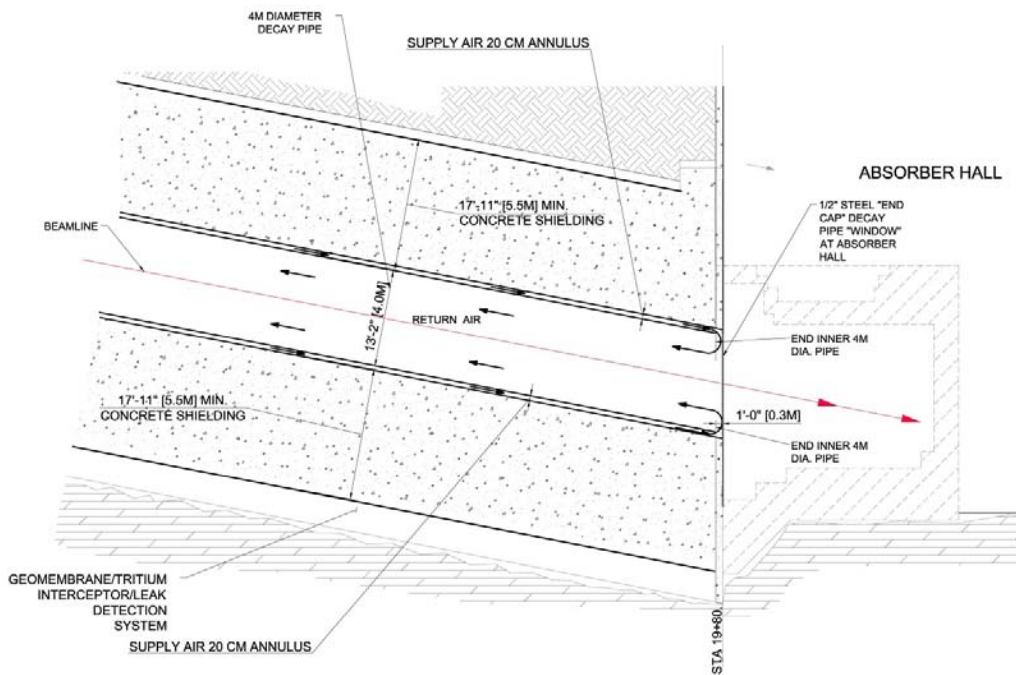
Longitudinal section of the Decay Pipe at Absorber Hall.
